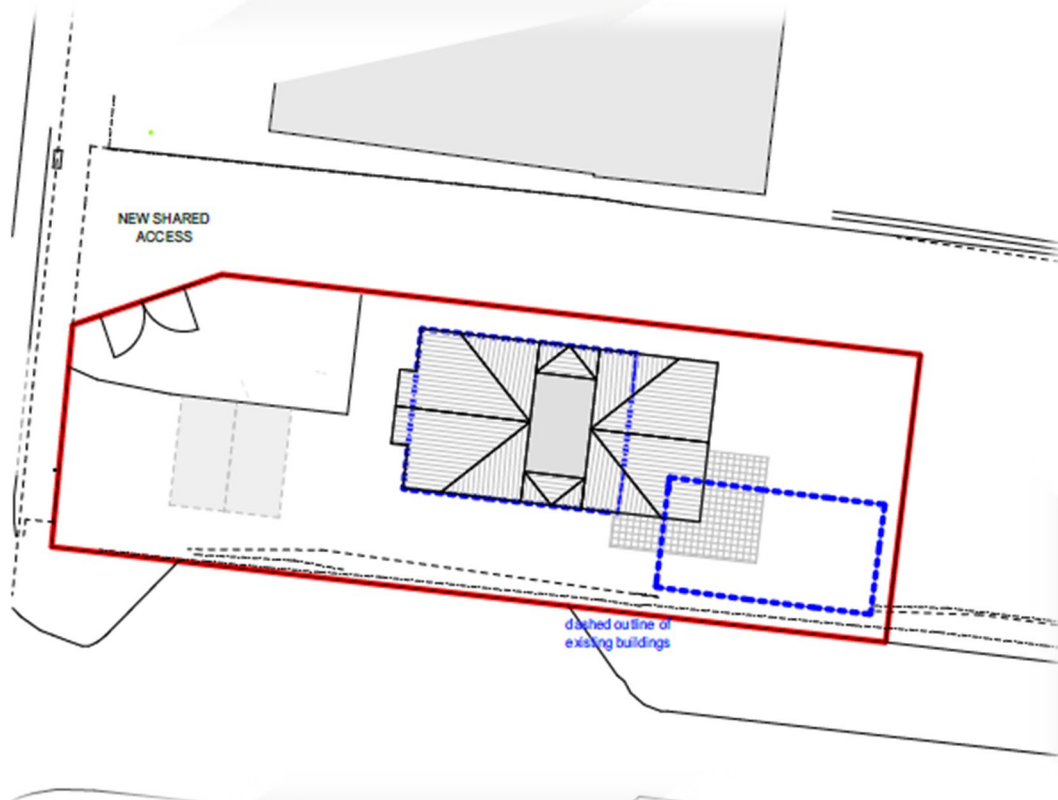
Proposed Site Plan: Option 1, Drawing No. 2024-22-F-001 (Studio Lap Chan)
